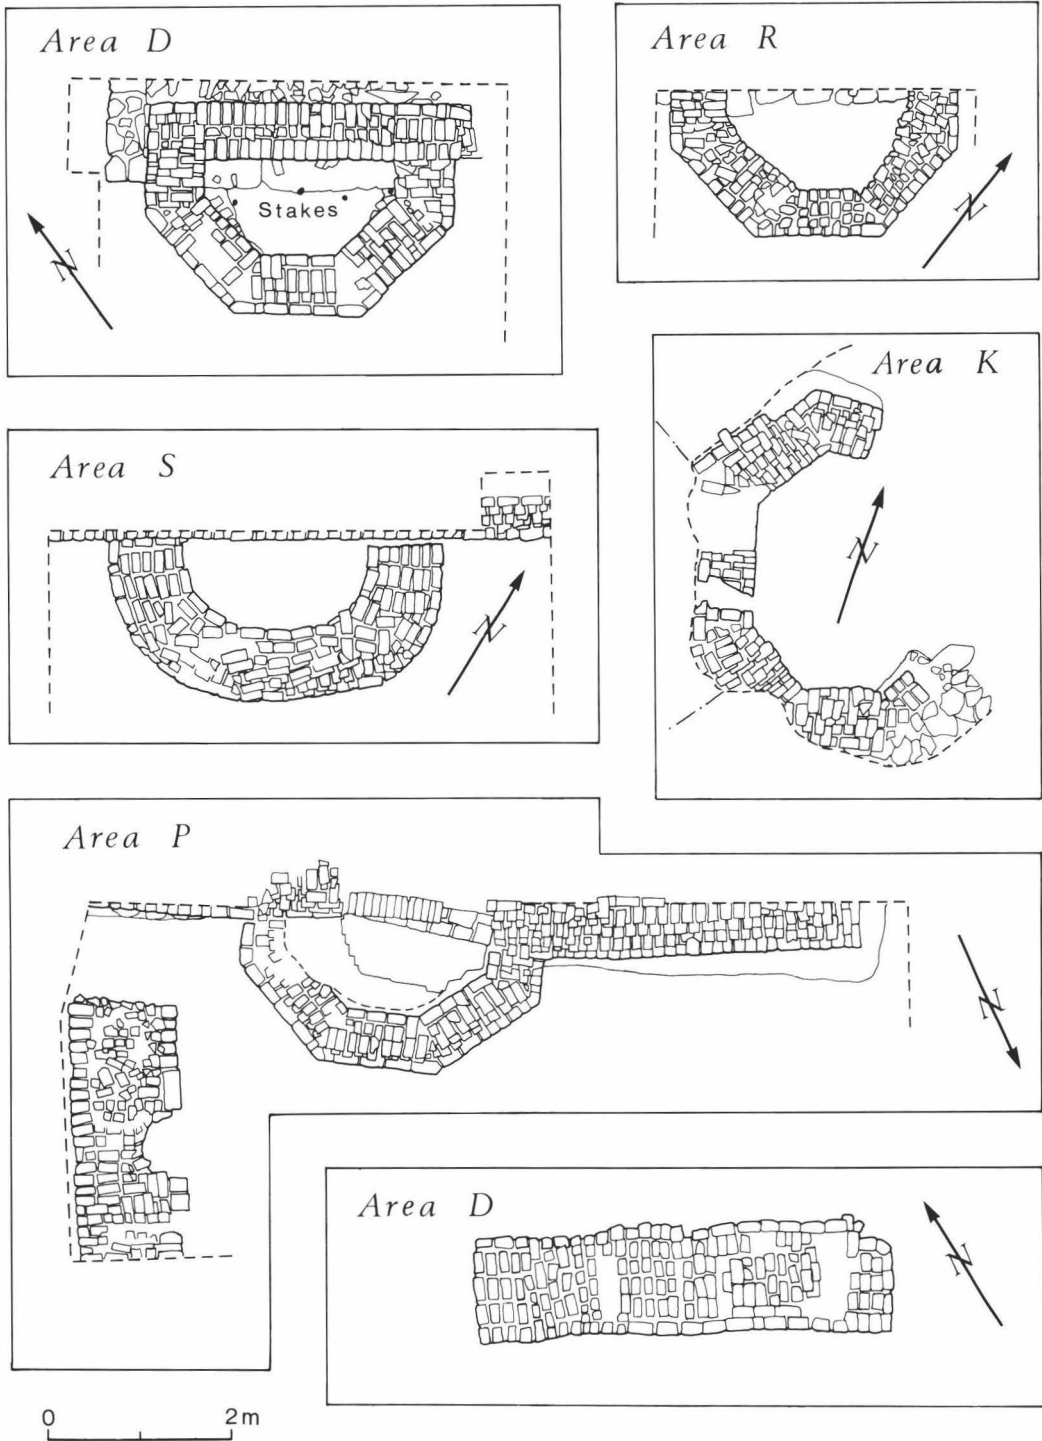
Laughton Place, 1984. Plan of brick wall-projections/towers in Areas D, K, P, R and S. Plan of brick bridge foundations in Areas D and P.
